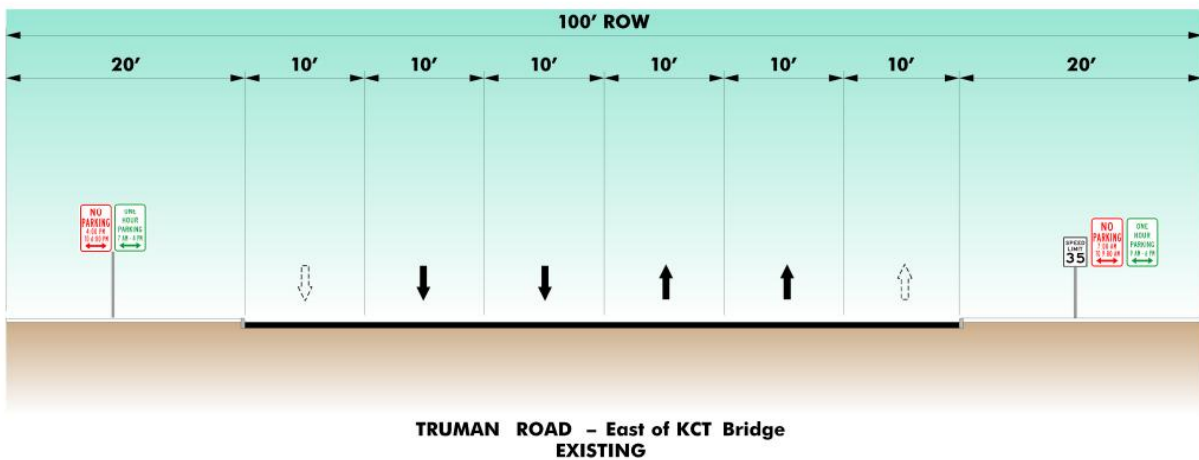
Enhanced Streetcar Typical Section - Truman Road, East of KCT Bridge, Existing Conditions
